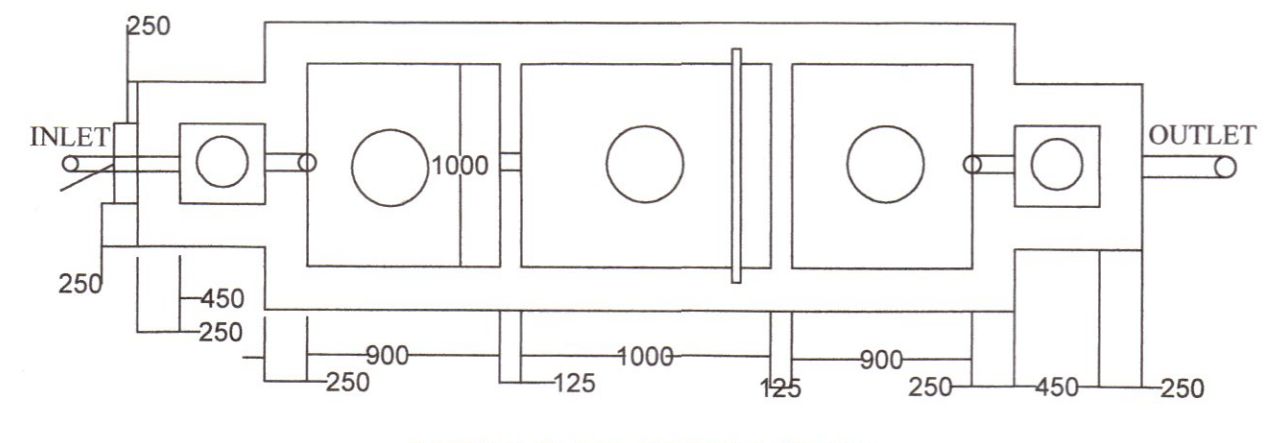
DETAILS OF S.U.G.W. RESERVOIR CAP-3000 Ltrs. Scale 1:50
